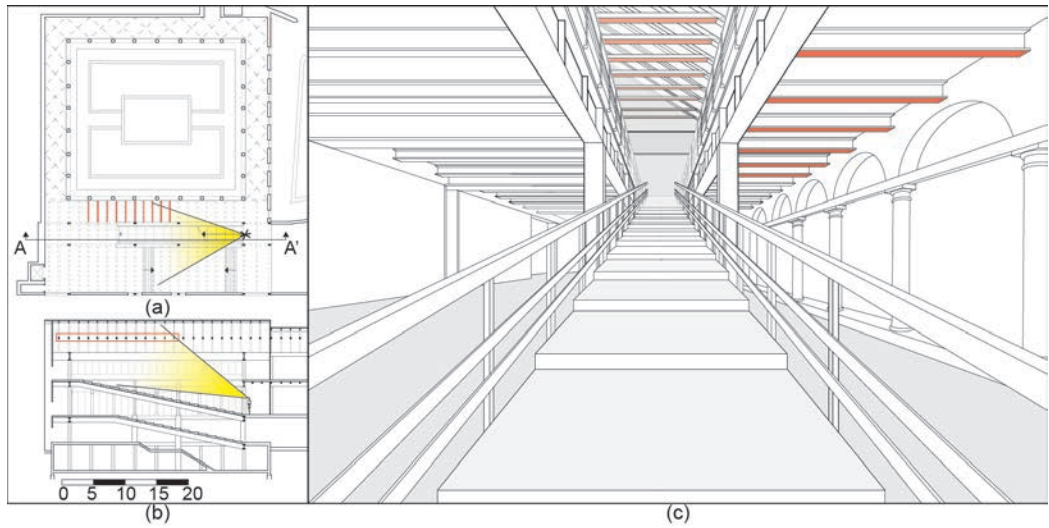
Sant'Agostino Museum, Genoa; (a) First floor plan: in red, the steel structure of the floor; (b) Section A-A', where the chains of the roof trusses are highlighted; (c) Internal view: in red, the beams of the structure.
